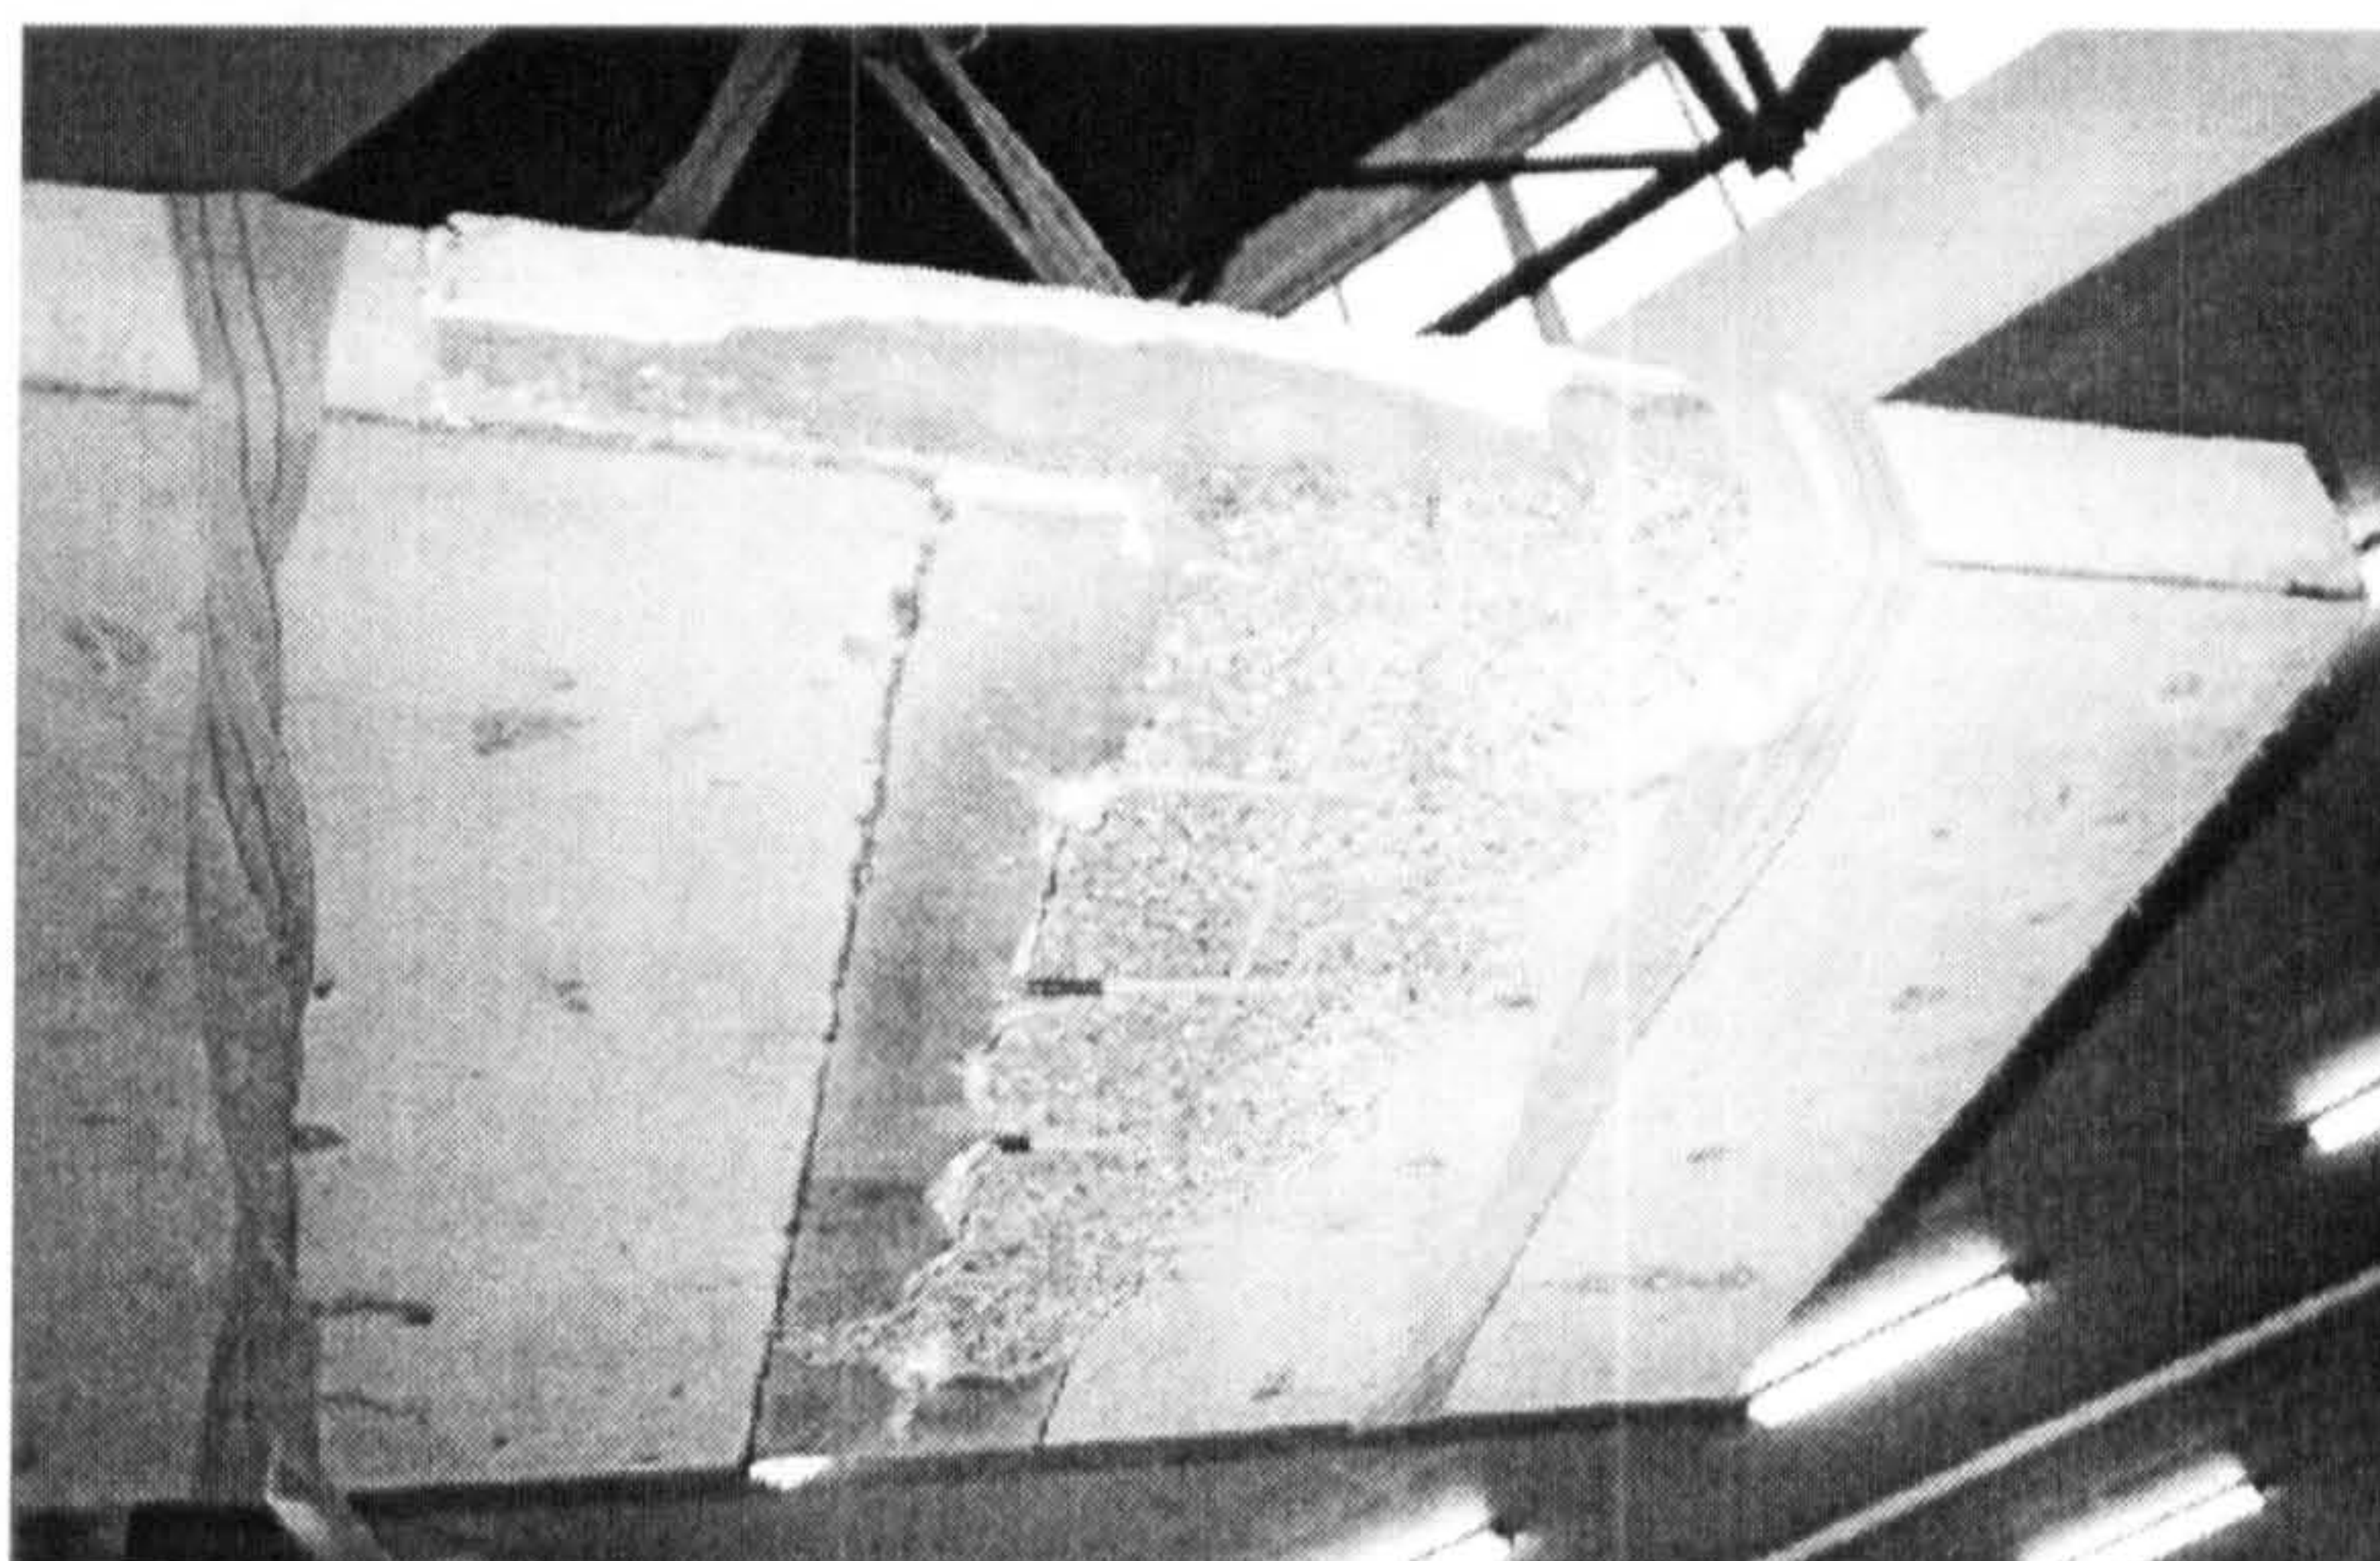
Distortion of lower surface of concrete slab of test specimen S1
